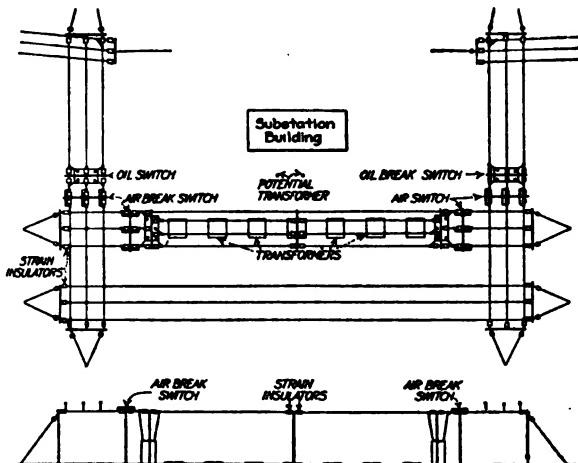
ARRANGEMENT OF OUTDOOR SUBSTATION EQUIPMENT AT MADEIRA, CAL.
